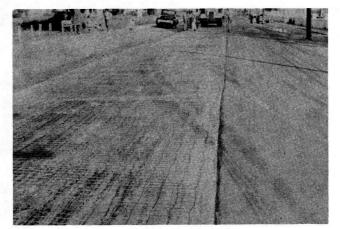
Fabric reinforcement in approach lane before placement of surface course. Note bulging along edge of fabric nearest centerline of pavement.
